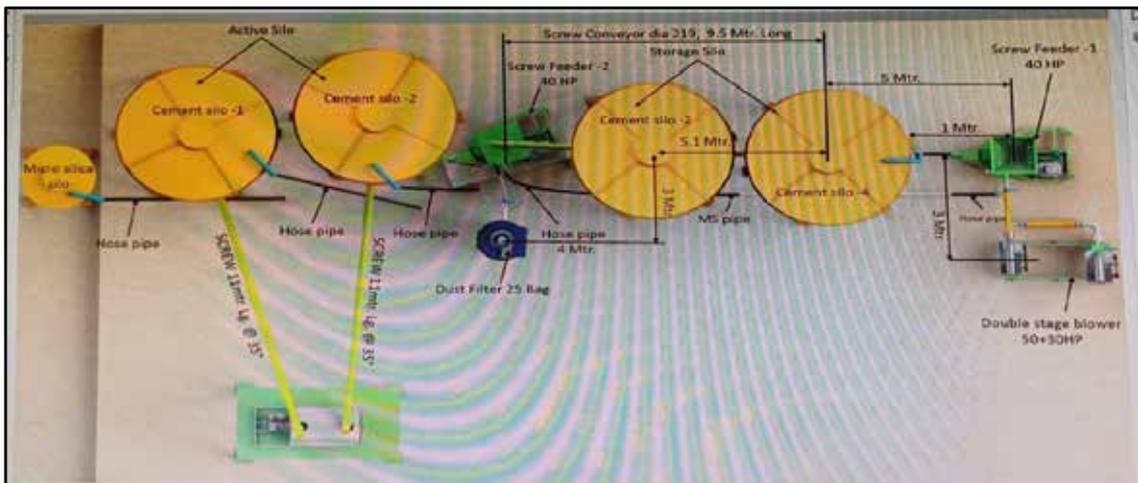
Sketch showing 120 Cum/hr. batching plant layout
